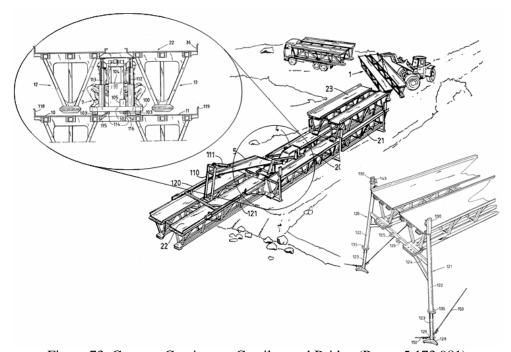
Concept Continuous Cantilevered Bridge (Patent 5,173,981)
